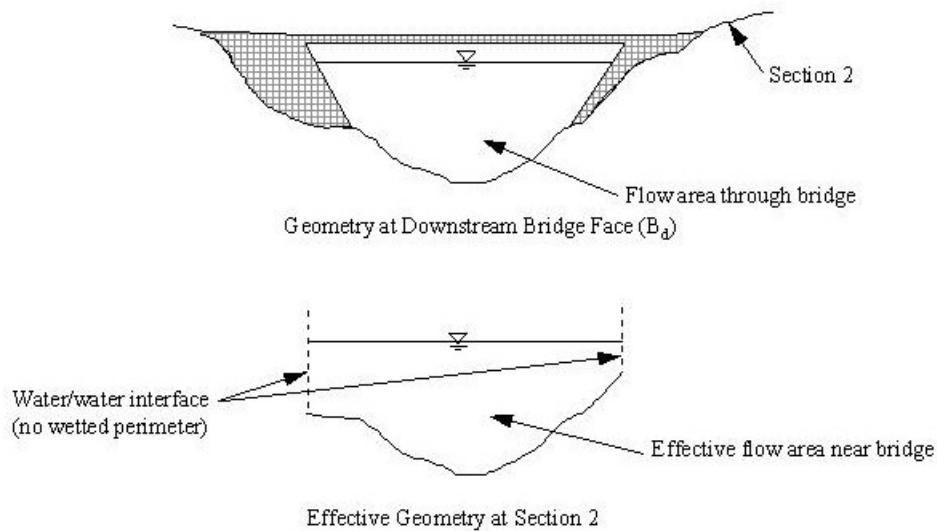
Effective Geometry for Bridge (Section 2 shown, Section 3 similar)
